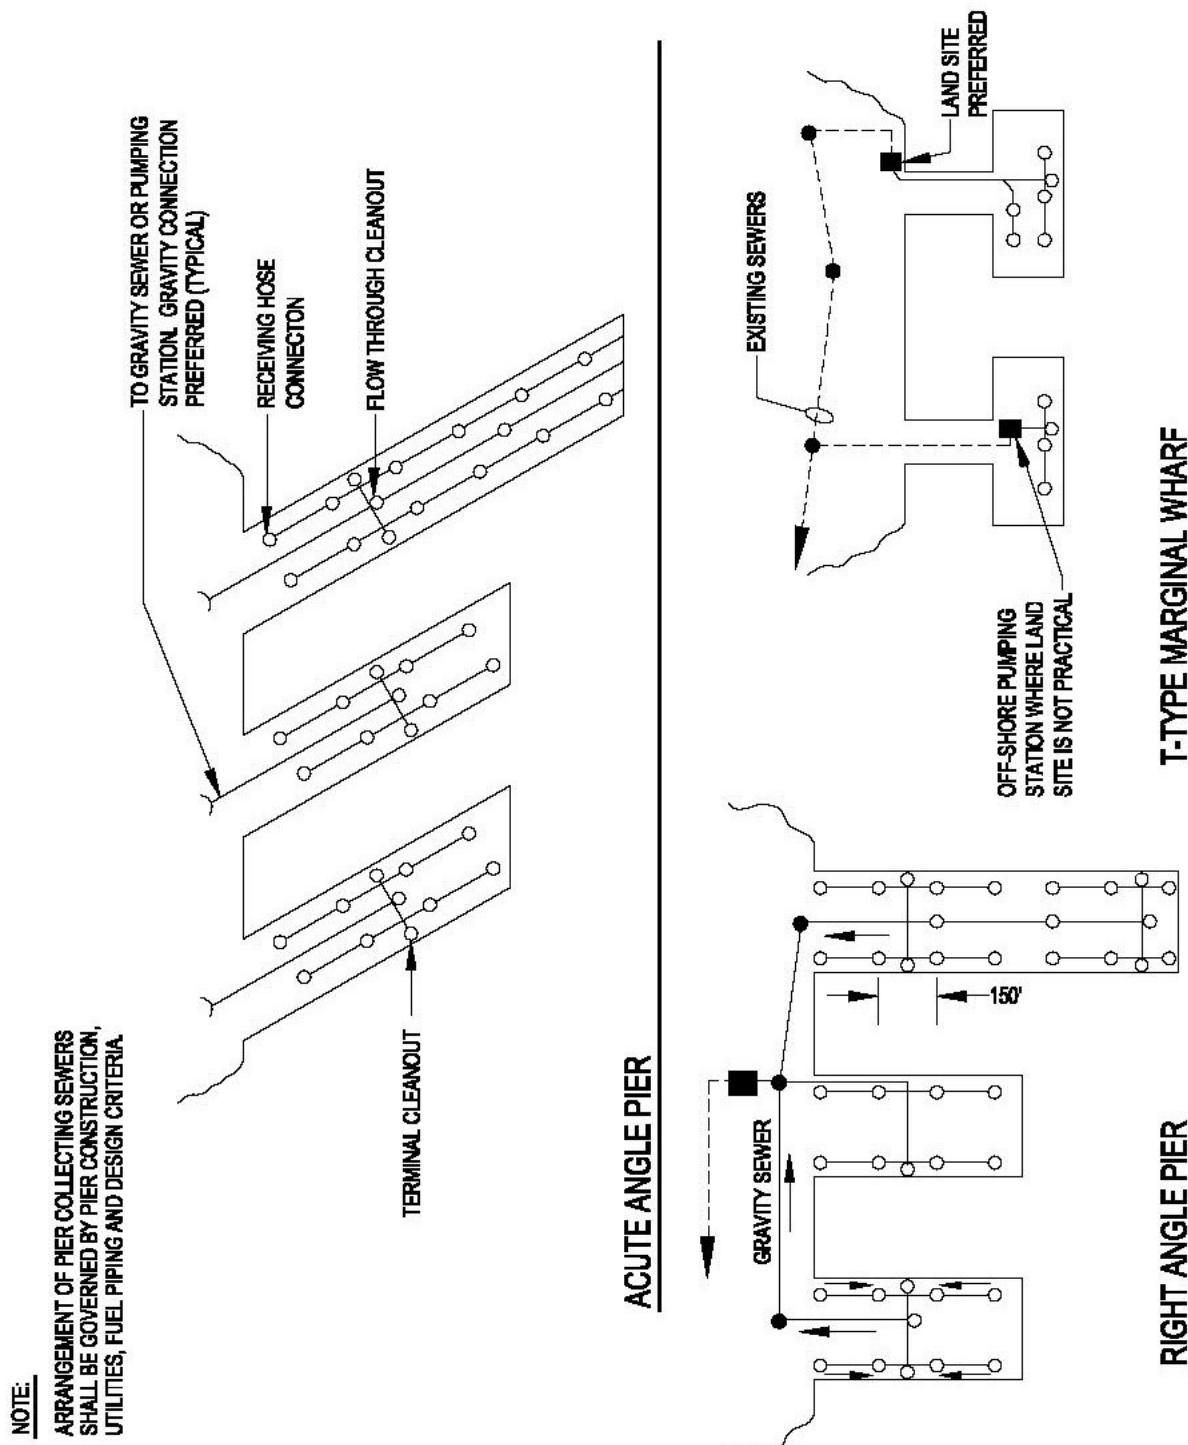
B Sewer Layout for Alternative Pier Types (2 of 2)
